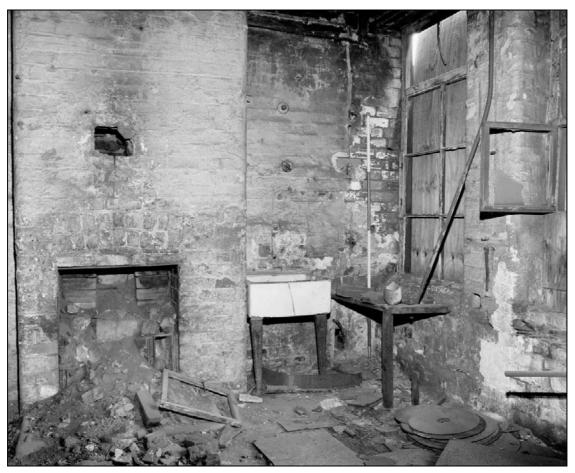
Detail of the northwest corner of F8 showing fireplace, ceramic sink and workbench (film 35.7)
